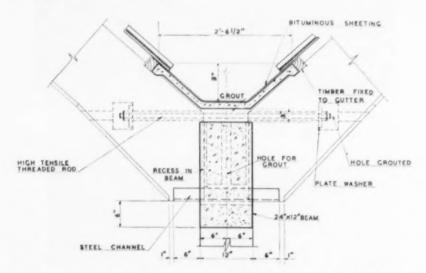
Detail at Junction of Roof Members at Valleys between Bays.
